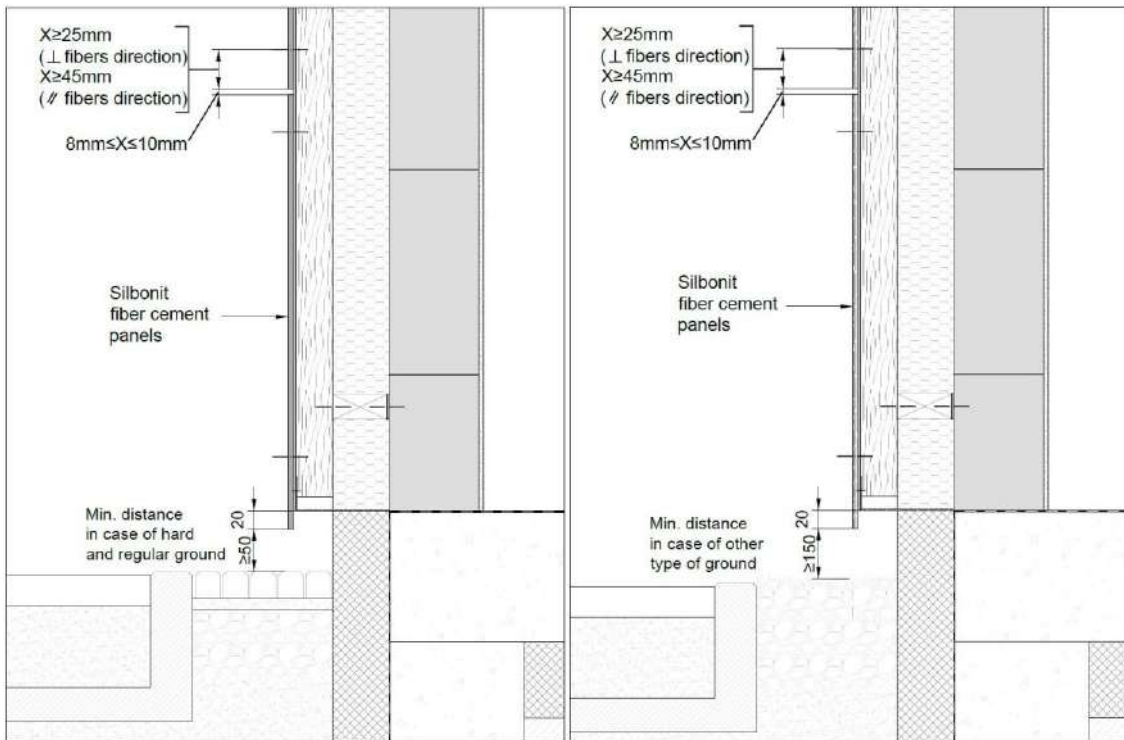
Example of vertical sections of the base of the ventilated facade cladding with two different slab solutions at the base of the building. Wooden subframe.
